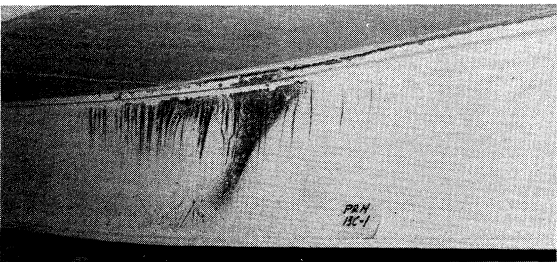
View of Beam 14b before removal from testing machine. Note the slip and separation between steel shape and concrete slab. The deep compression-type yield lines occurred after the shear failure took place and the steel beam flange buckled laterally while the web buckled locally. The absence of tension yield lines above the middle of the web is apparent. The beam did not reach its calculated  $M_u$ .
